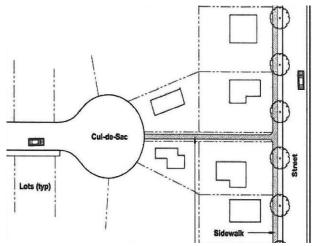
A: 10 ft. access easement from head of cul-de-sac to nearest street or path
